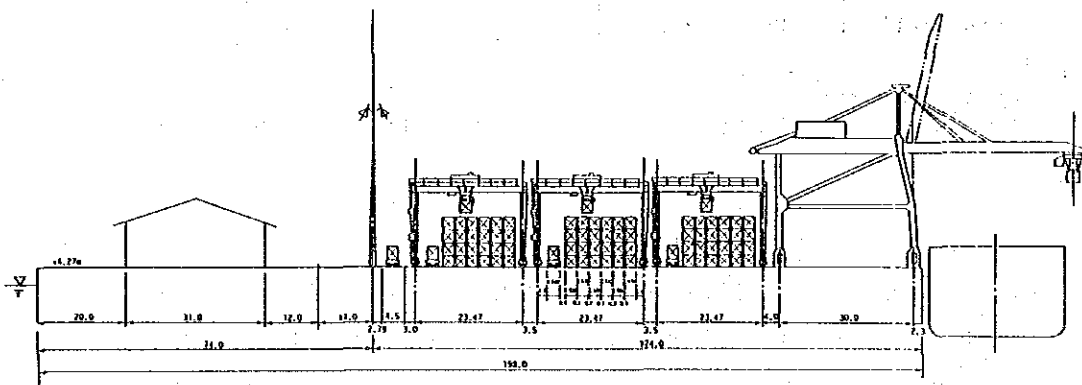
A Cross Section of No.4, 5 Berth and No.7, 8 (Unit: m)
